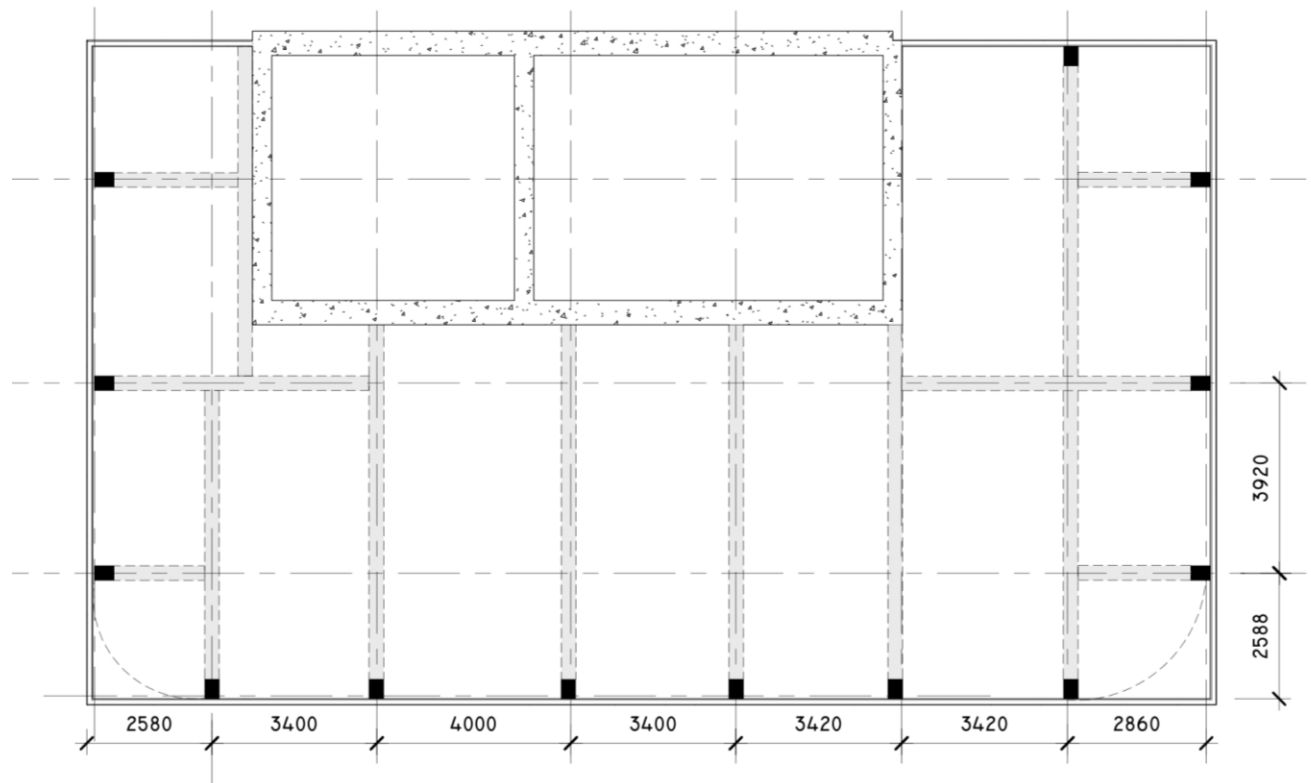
Timber case study, simplified structural plan. Authors own drawing.
